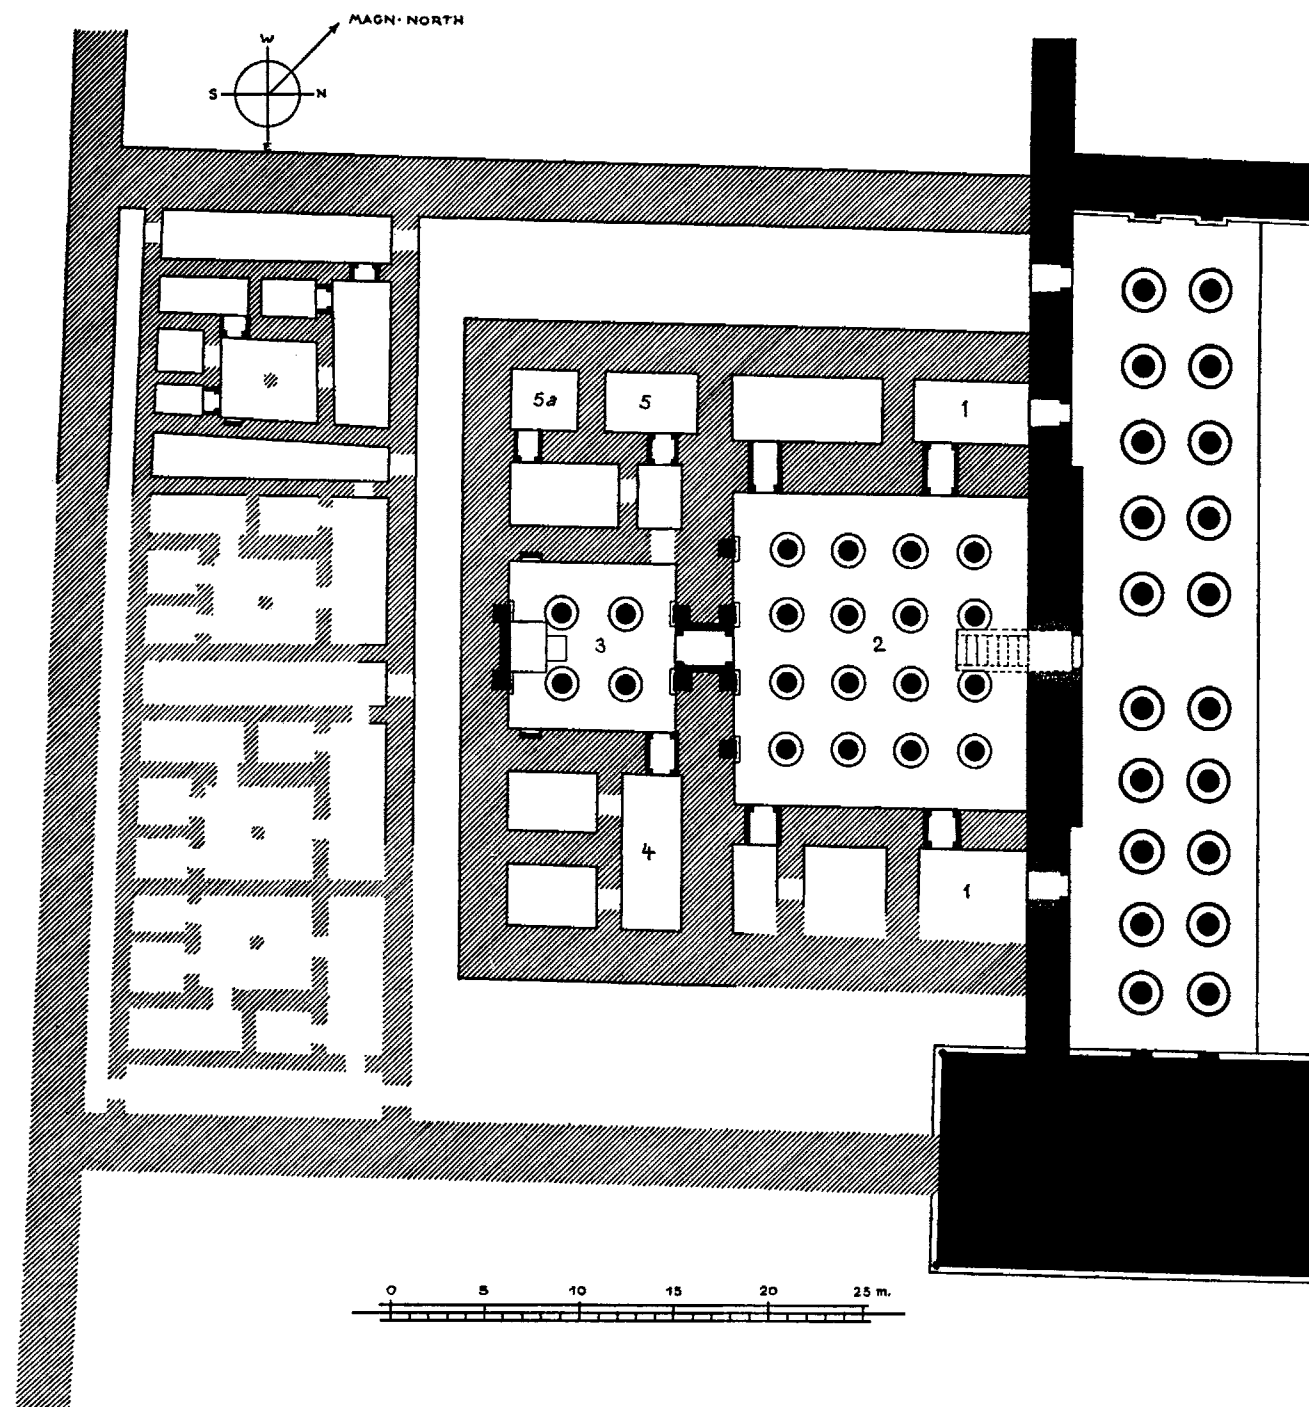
GROUND PLAN OF THE RAMESSEUM PALACE. RECONSTRUCTION. SCALE, 1:400
